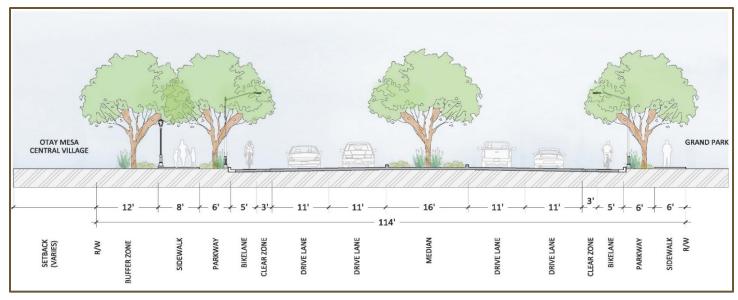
Cactus Road Streetscape (South of Airway Road)
